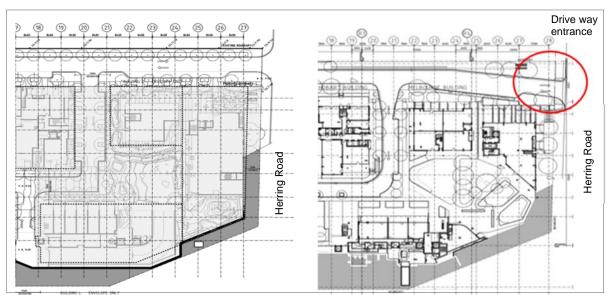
Approved access driveway (left) and proposed access driveway (right) (Source: Proponent)
